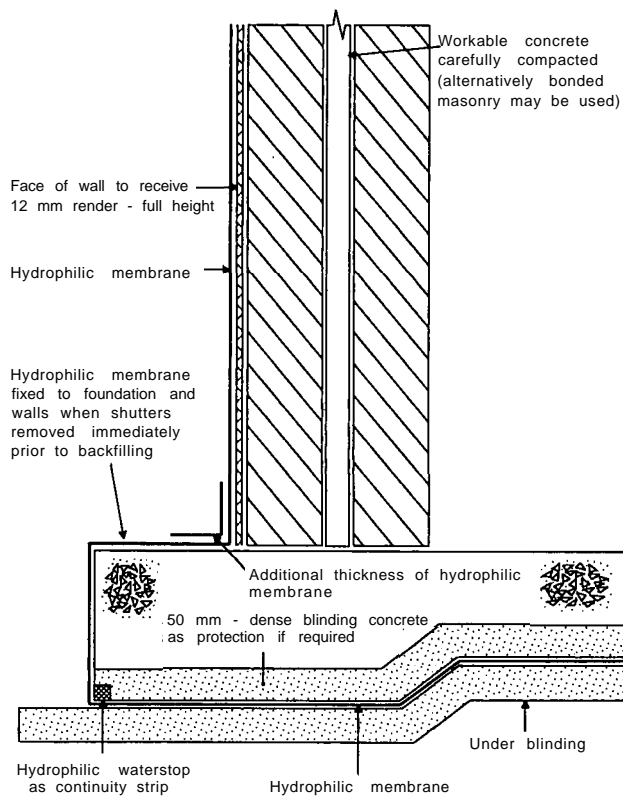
Masonry structure with external hydrophilic tanking (Type Ae) ( Details similar for other types of structural wall )
